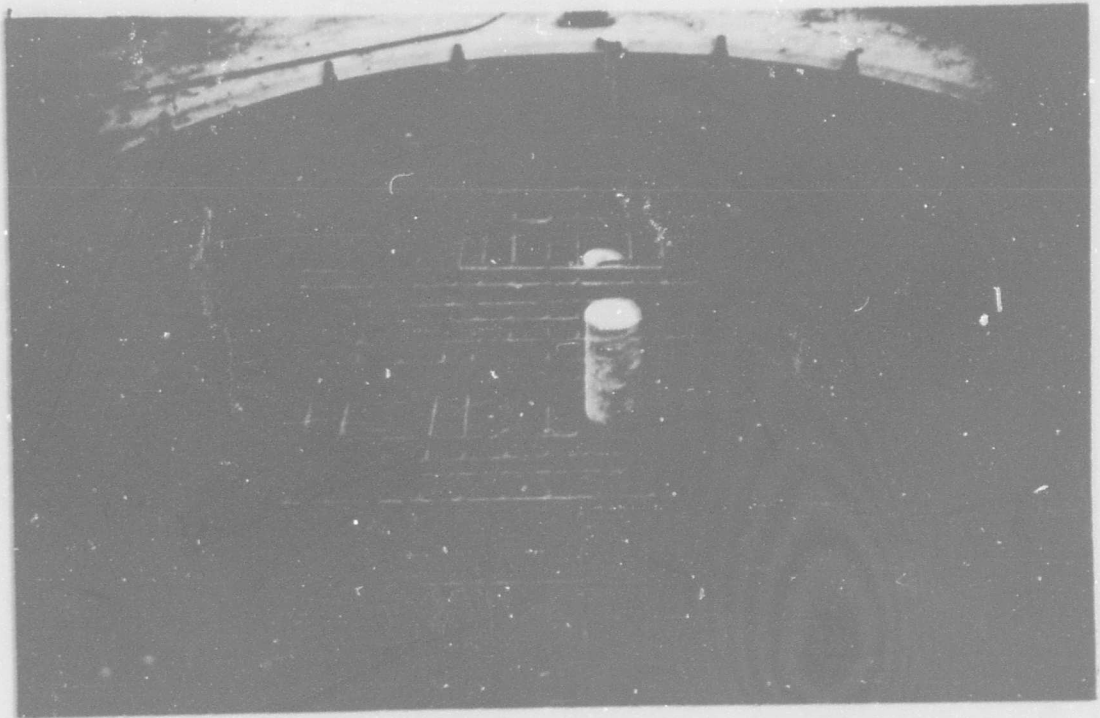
Full Scale Closure Showing Stirrups and Top Layer of Reinforcing Steel.
